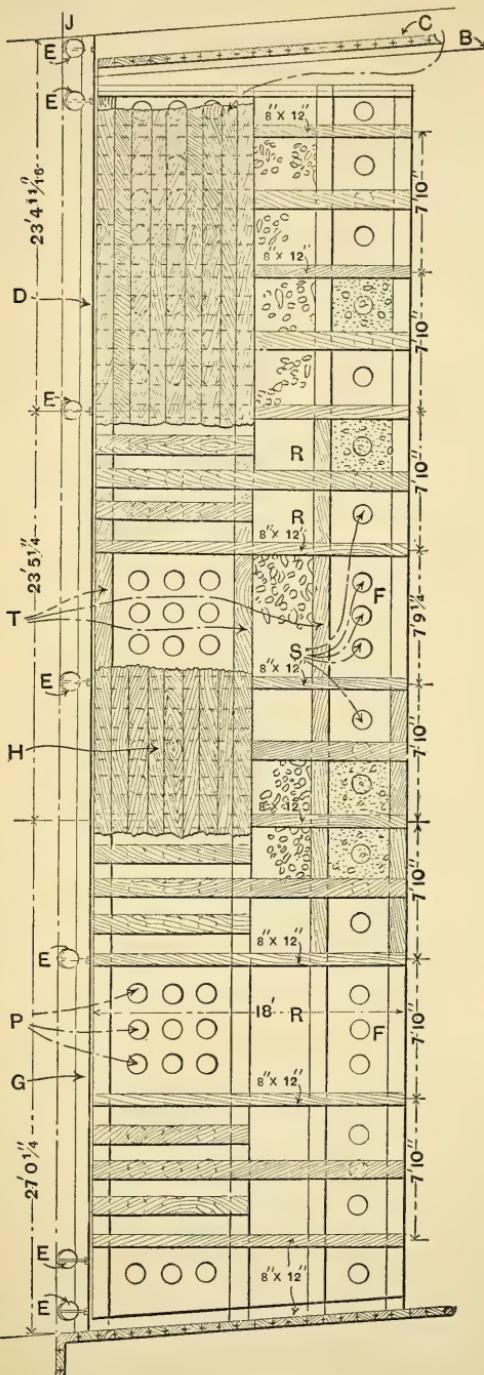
illustrates the construction of one of the end piers for the drawbridge. Two of these end piers and one center pier were constructed in the manner exhibited for a single track drawbridge, in about 18 feet of fresh water, flowing at the rate of five miles an hour. As there are no worms to destroy the timber in the fresh water of the Great Lakes, this was the most economical way to construct permanent foundations for the bridge.
